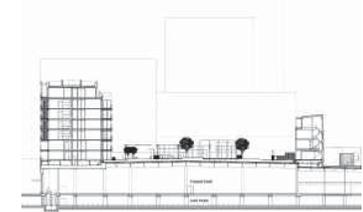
and 98: Hallsville Quarter, Canning Town, Photo and Section Diagram
